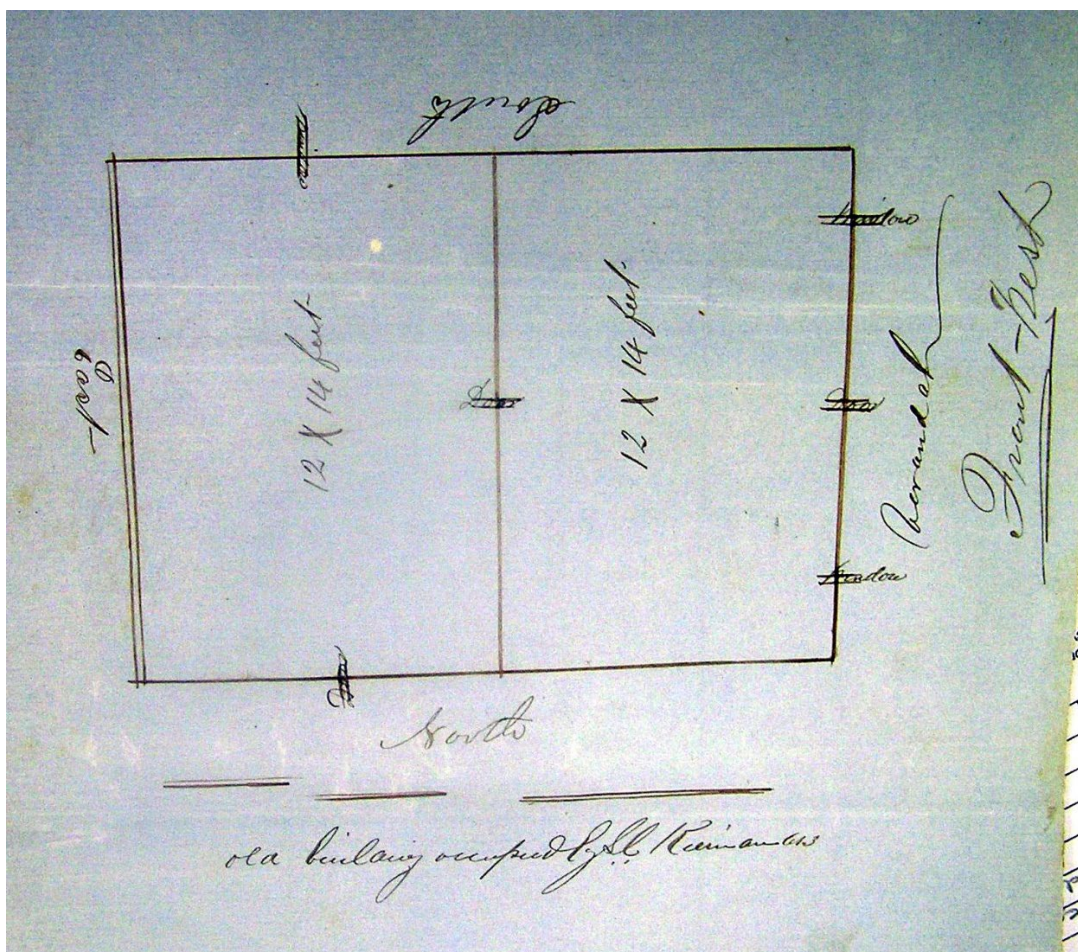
Sketch plan of old court house proposed for alteration and relocation to the police quarters, 1871.
